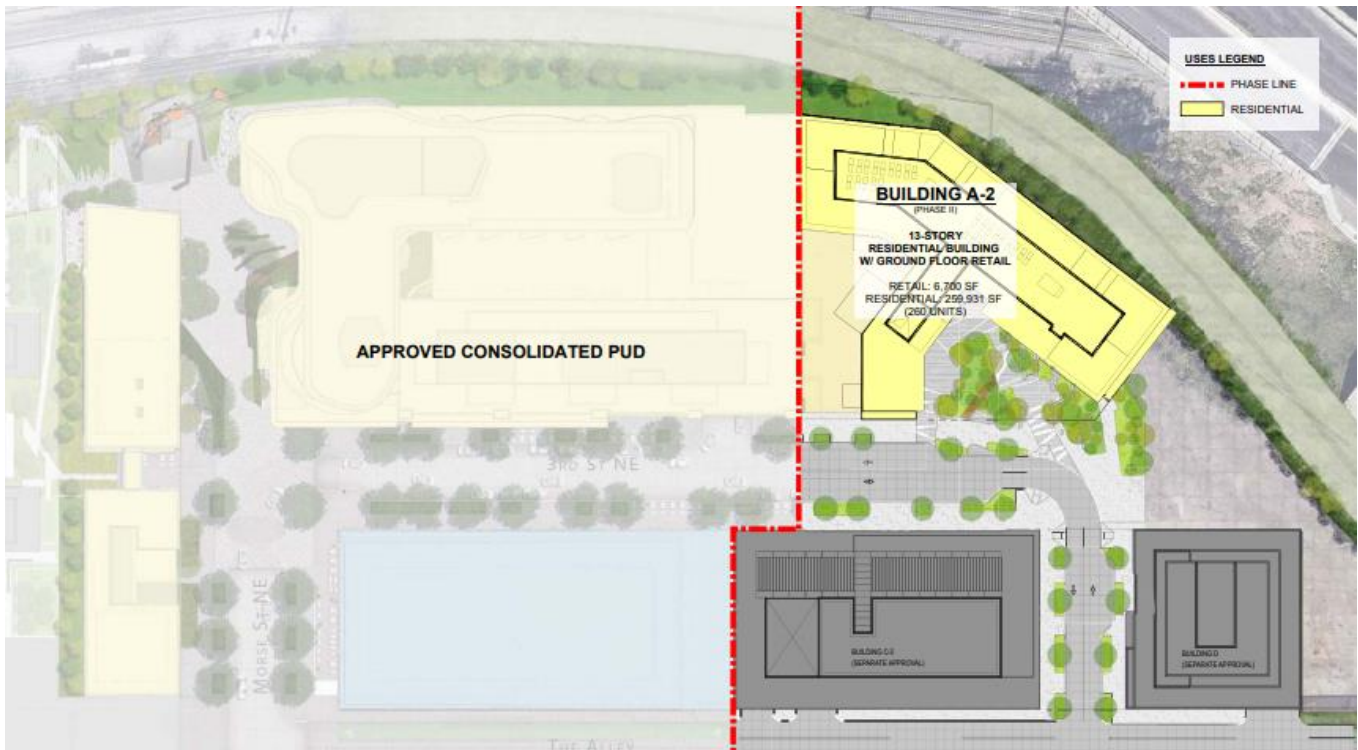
Site Plan for Building A-2 (image provided by applicant in Exhibit 4B1).
